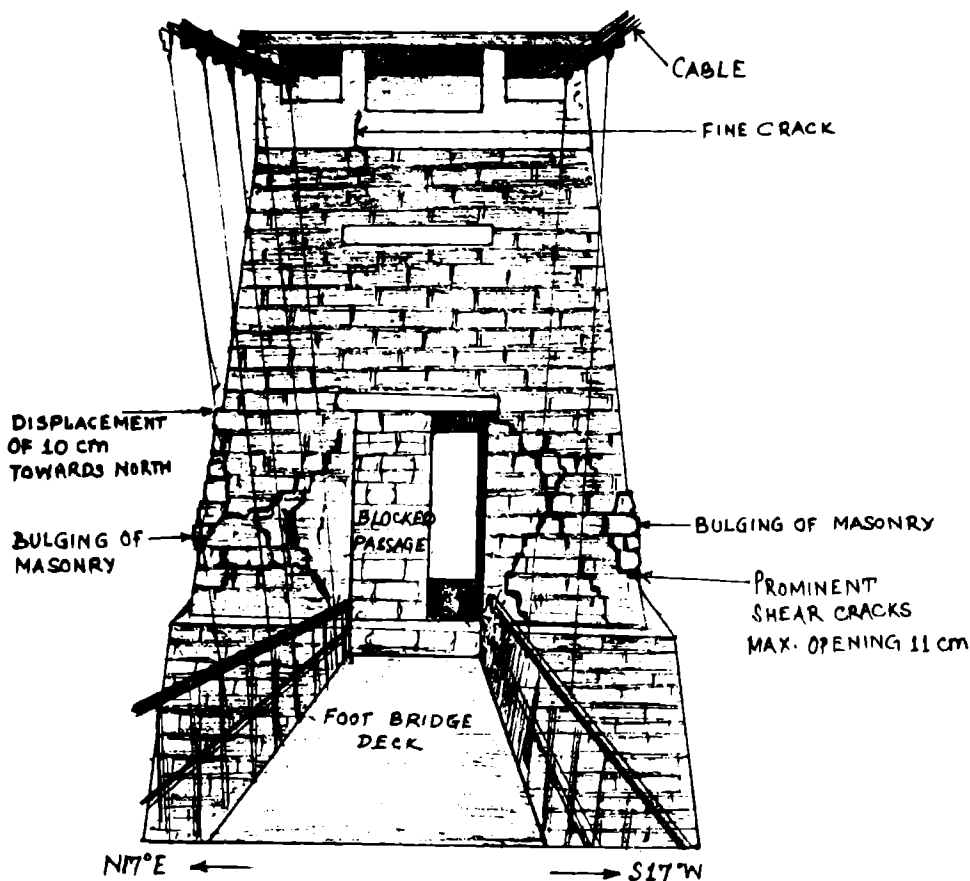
SHEAR CRACKS IN THE LEFT ABUTMENT TOWER, DEDSARI SUSPENSION BRIDGE (SKETCH BY P. PANDE)
